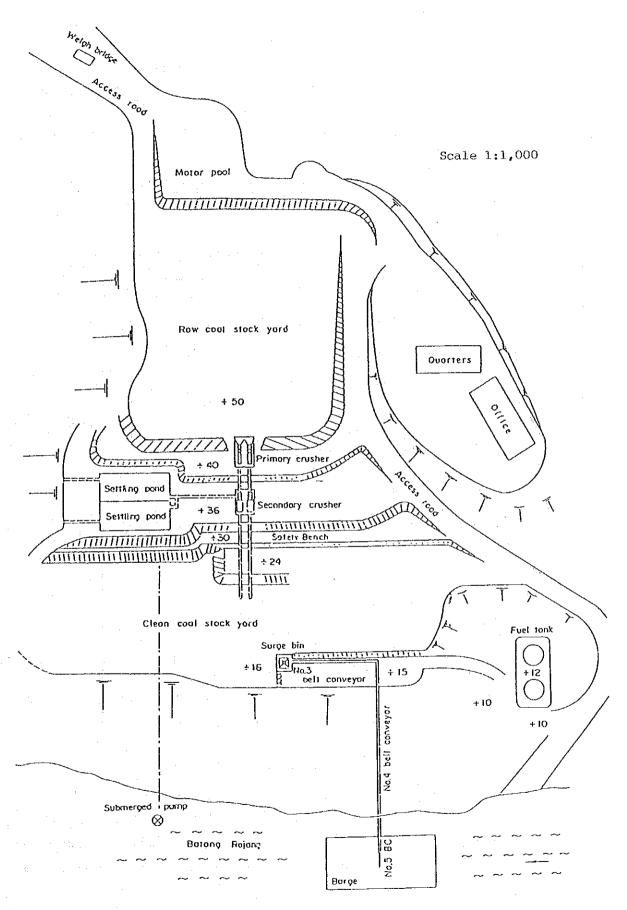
Layout of Plant and Facilities of Loading Site
